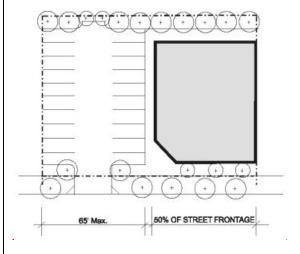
(A): Example of parking width restriction and street frontage requirement.
